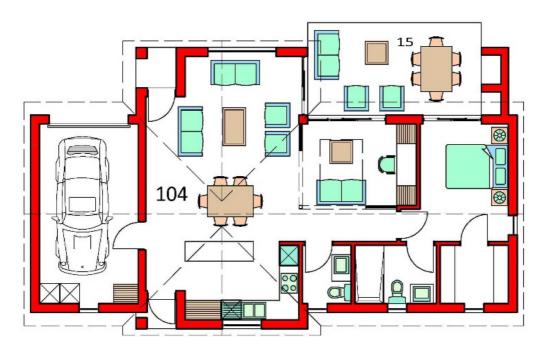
Floorplan of variation – north entry (Type A) 104m².
